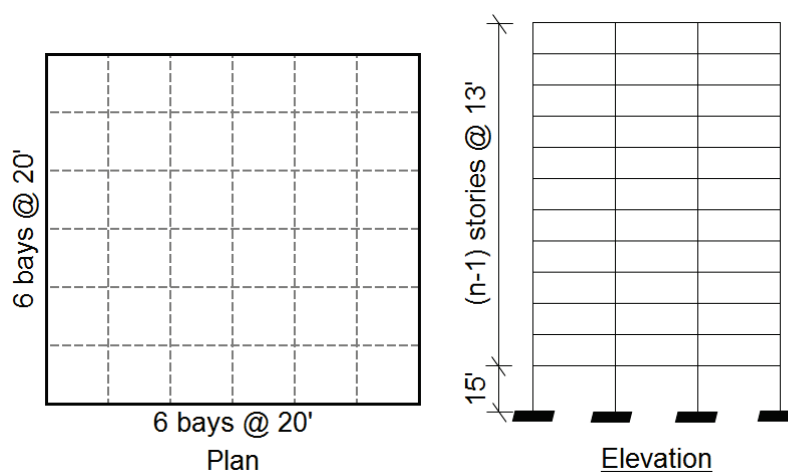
Plan and elevation of the RC moment frame archetypes.
